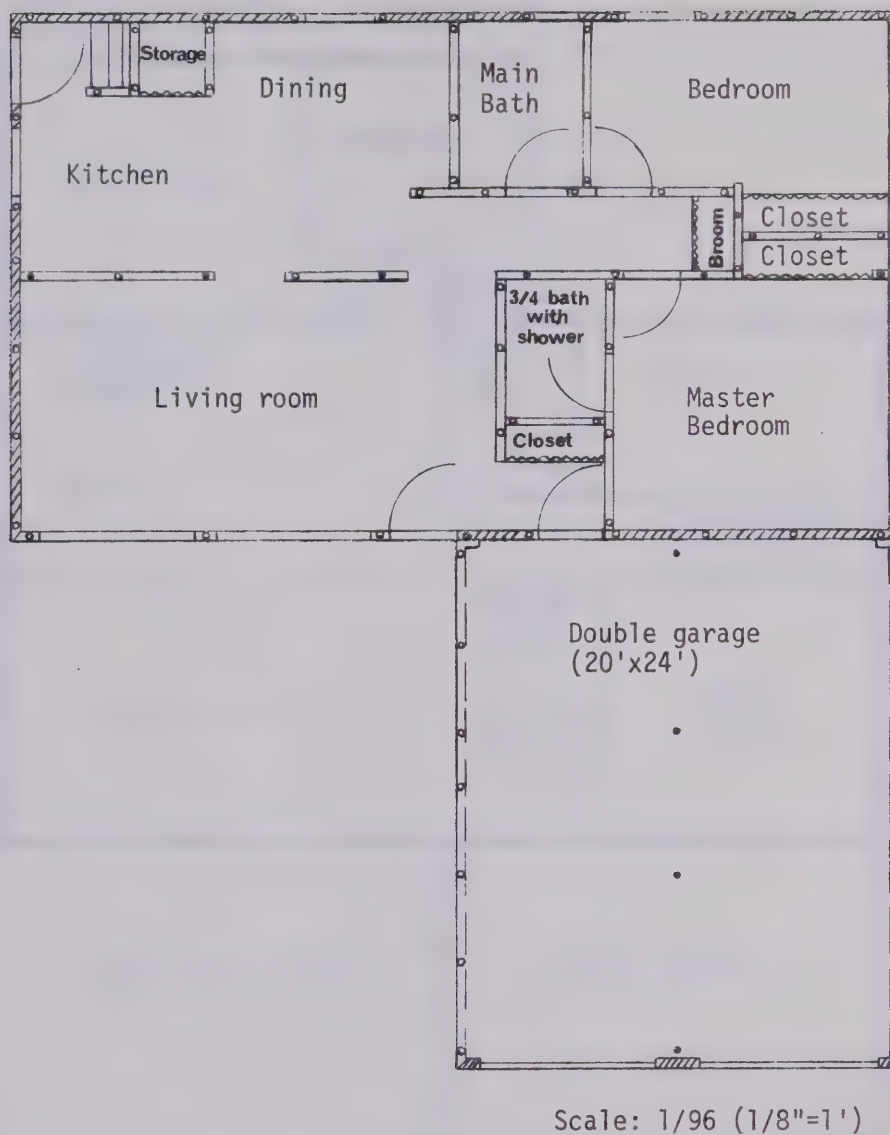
960 square feet (40'x24') two bedroom floor plan and a double garage (20'x24')
